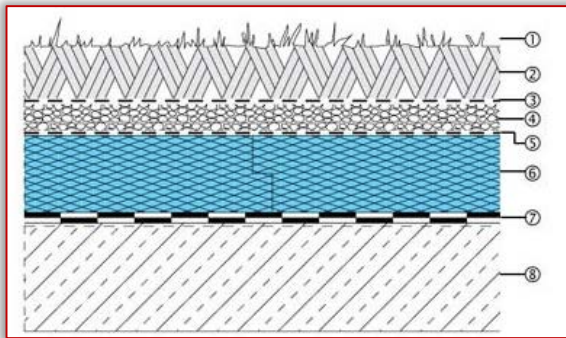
Extensive roof with drainage system: 1) extensive lawn - vegetation; 2) soil layer 80-100 mm thick; 3) separation/filtration layer; 4) drainage layer; 5) fabric (e.g. polypropylene) 110-140 g/m²; 6) insulation material; 7) bituminous waterproofing sheet; 8) concrete ceiling
